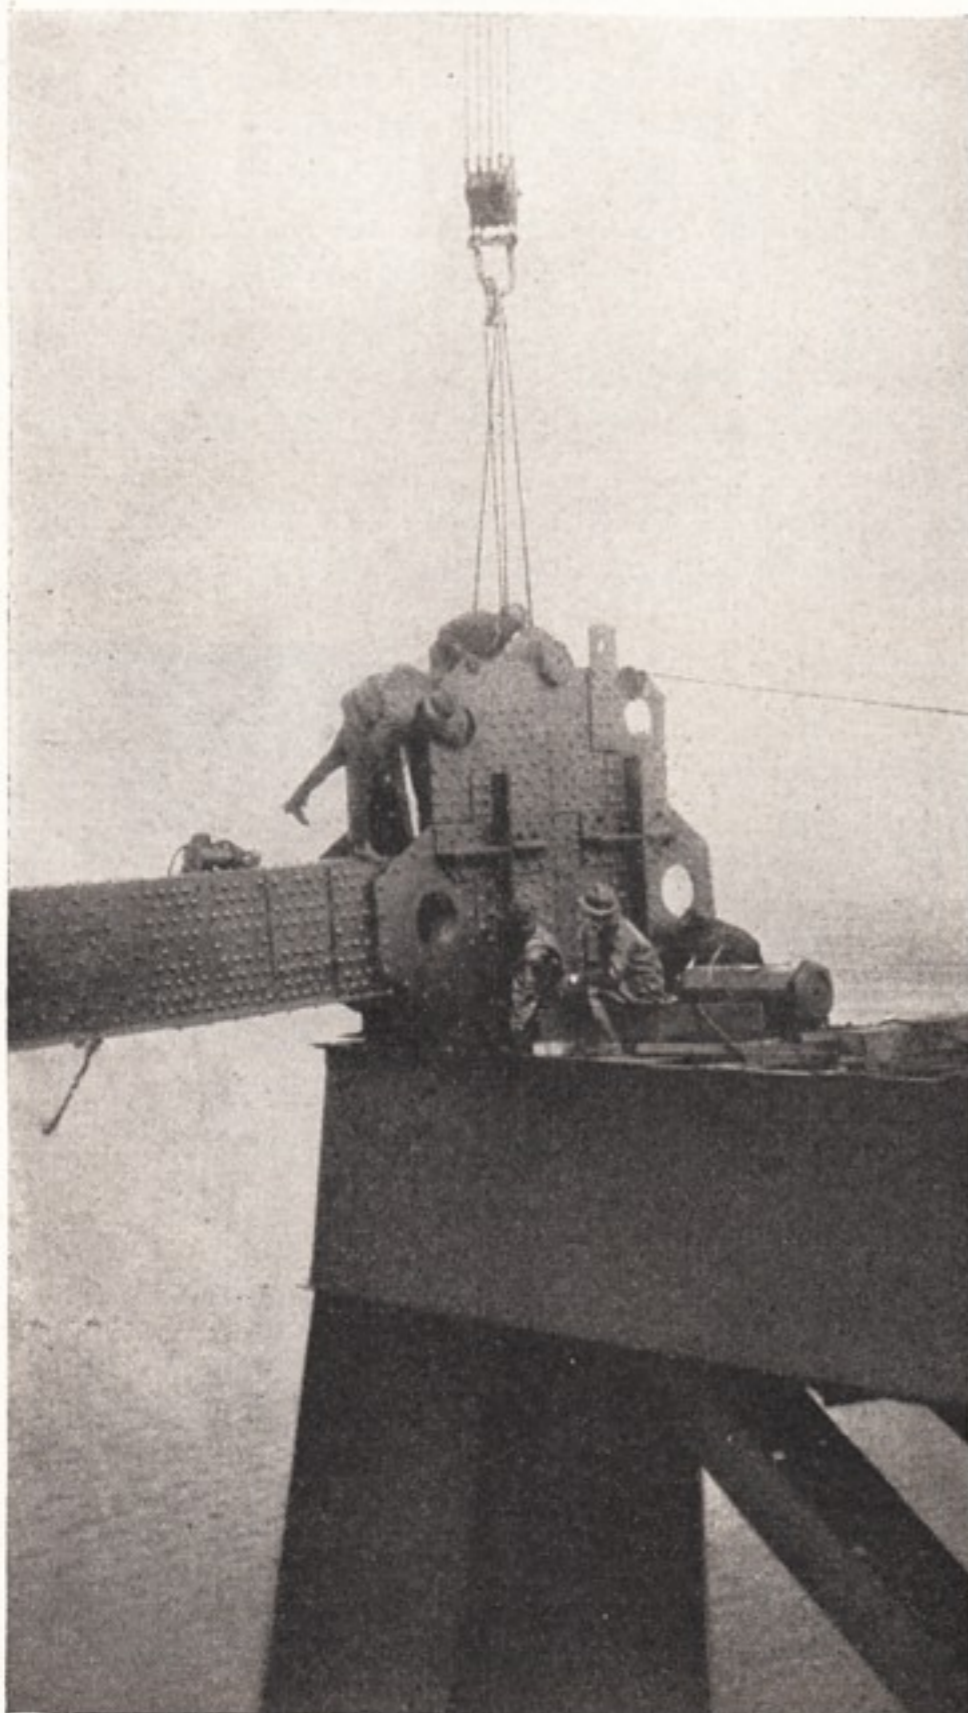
SETTING MAIN SHOE ON TOP OF TOWER AT PIER 2
